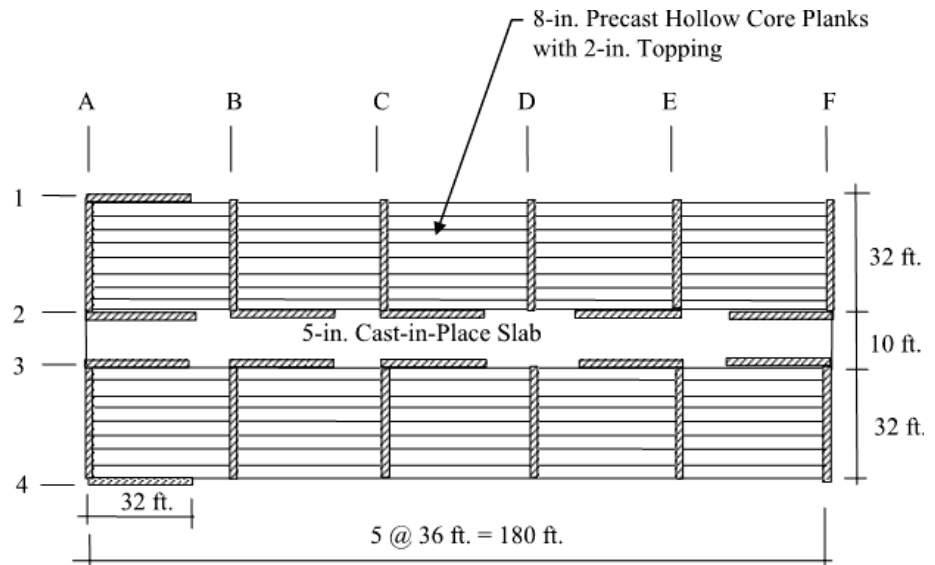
Reinforced masonry residential occupancy building from NIST GCR 10-917-8—plan view.
